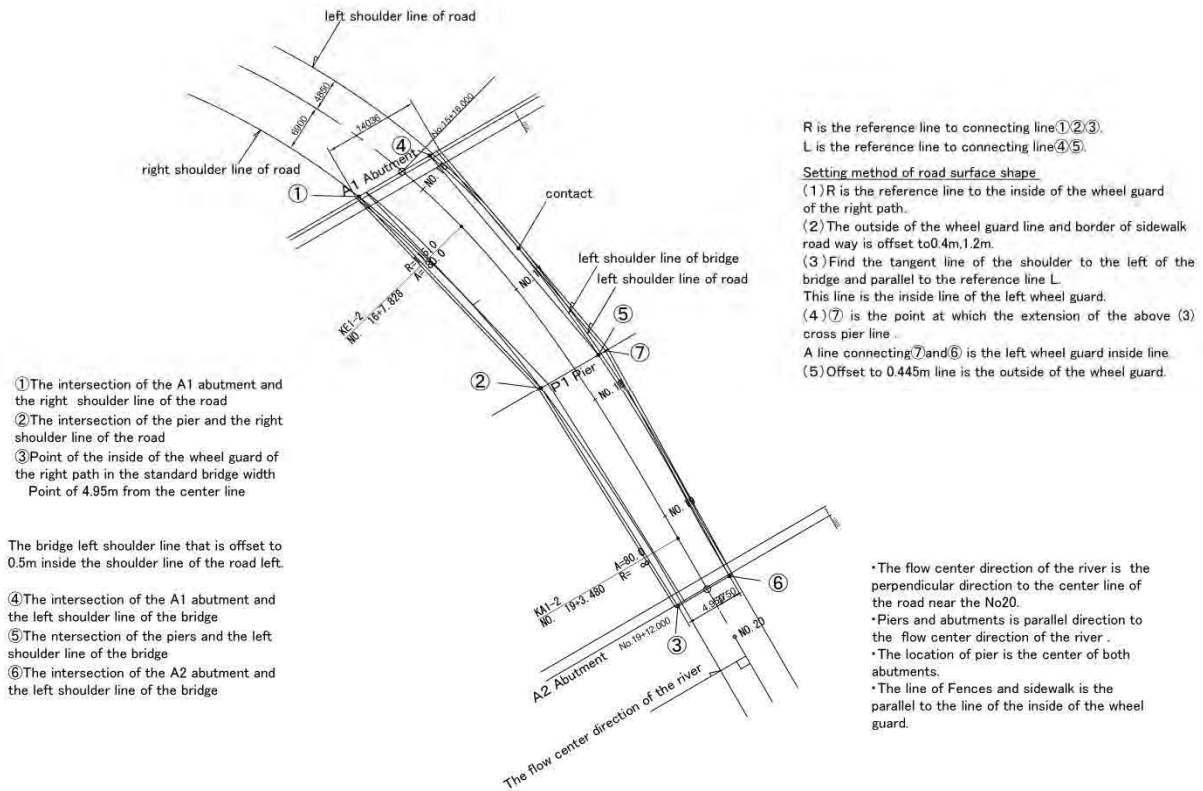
Bridge Widening Method on Aum Bridge
